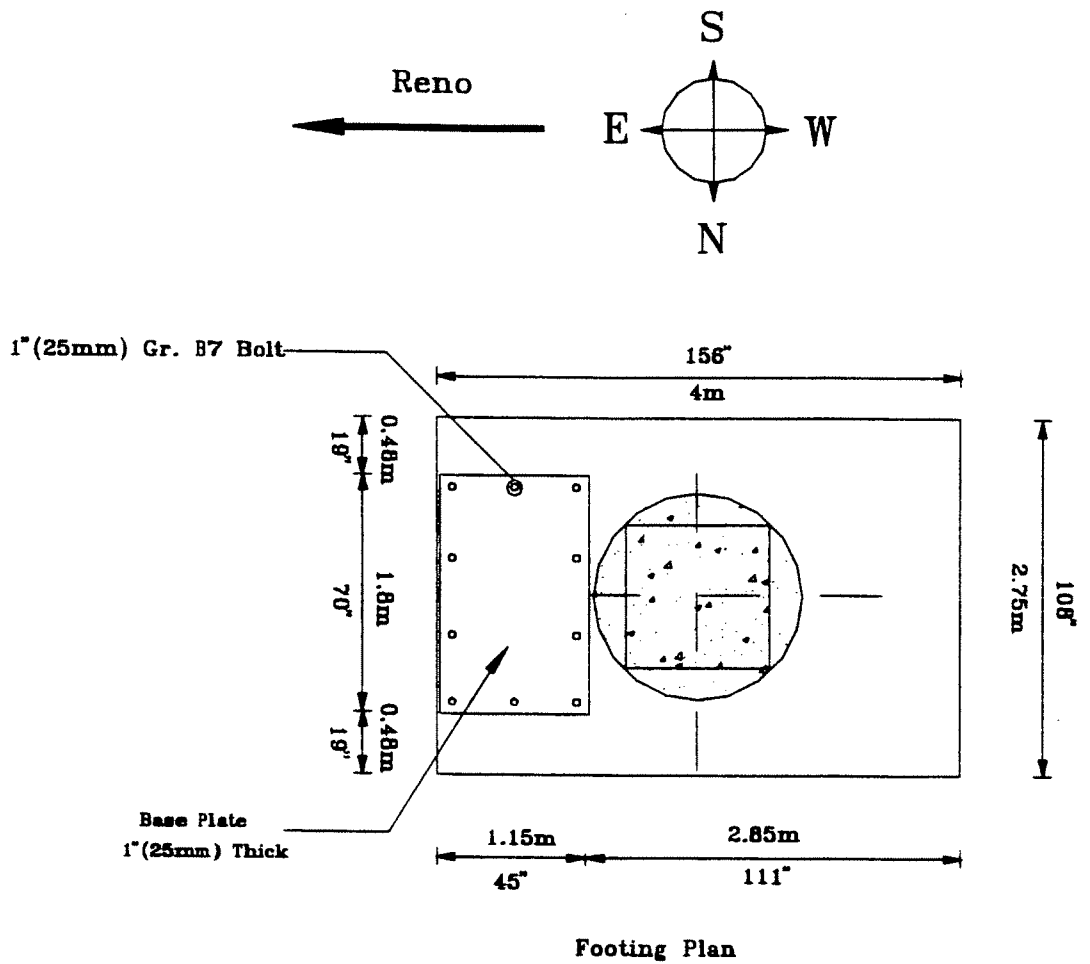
Steel Base Plate Attachment to the Bridge Footing
